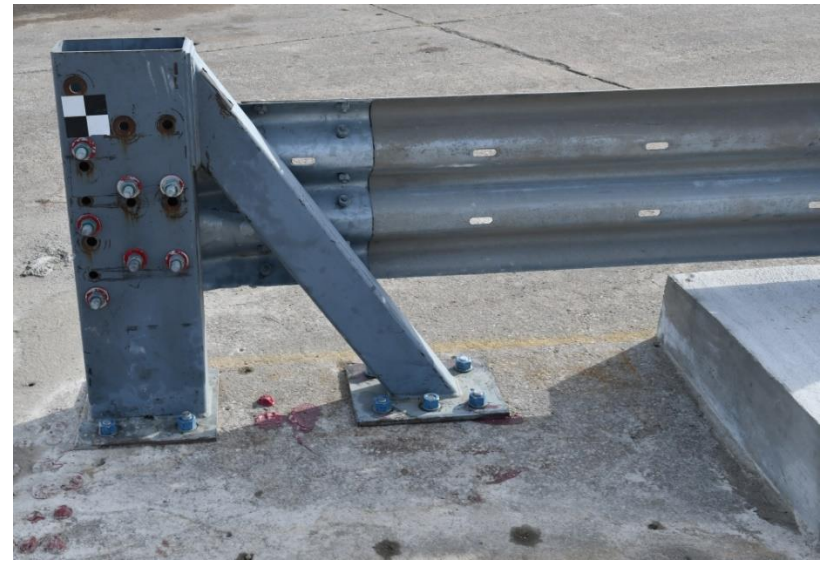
Test Installation: End Anchorage Assemblies, Test No. HMDT-1
